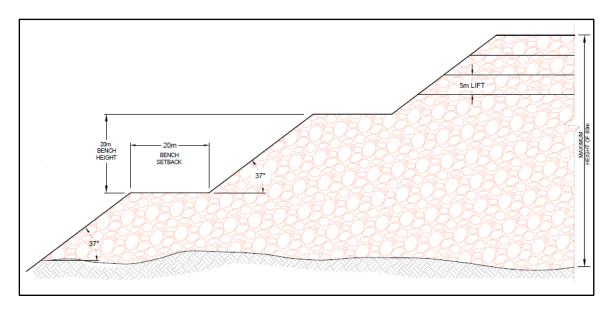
Typical Cross Section of the Whale Tail Waste Rock Storage Facility
